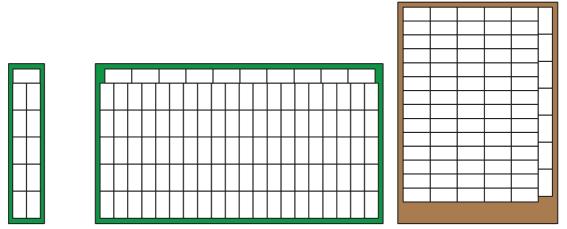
Placement for PV panels on a terraced or detached house (left) and flat house on the roof (middle) and south facade (right)
